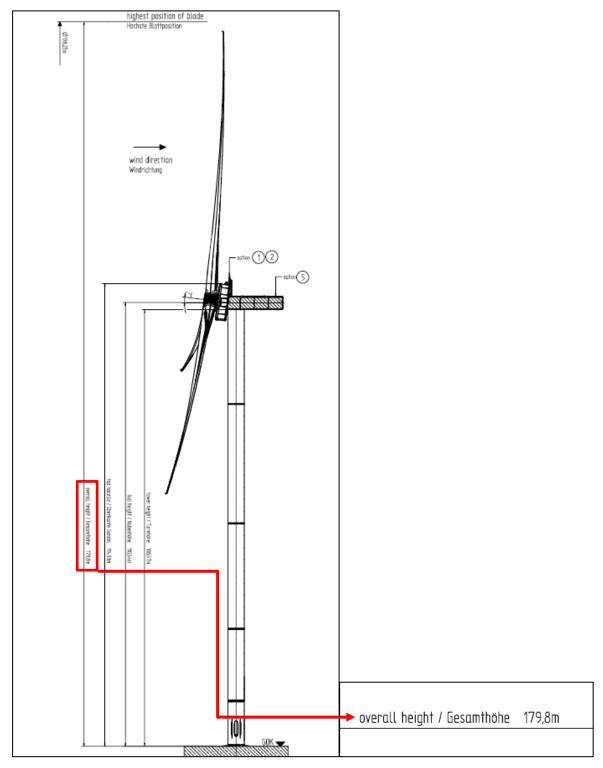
Provided Turbine Height (111m Tubular E-138 EP3 E3-ST-111-FB-C-01\_D03024558\_2.0\_Layout drawing\_steeltower.pdf)
